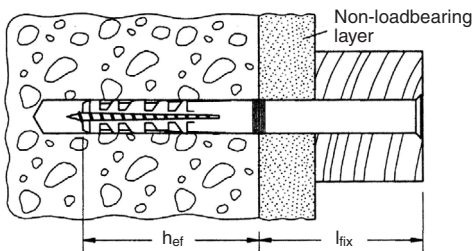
Accounting for non-load-bearing layer in determining the useable fastening length
